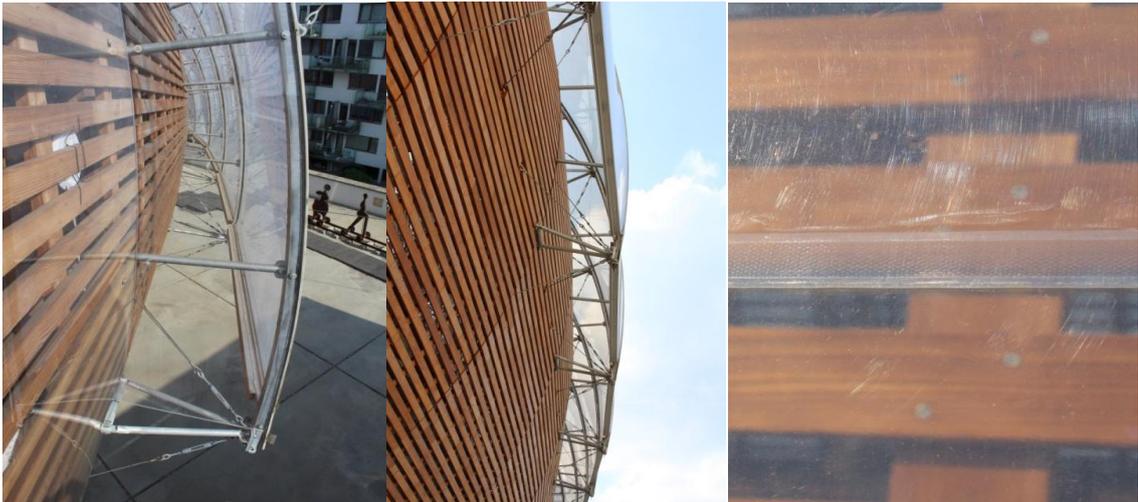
Detailing of the ETFE foil application [by author 6/2018]
